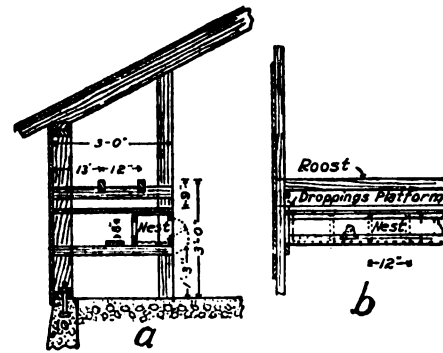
Desirable arrangement of roosts, droppings board and nests, with dimensions, shown in section as seen from the end (a) and front (b).
